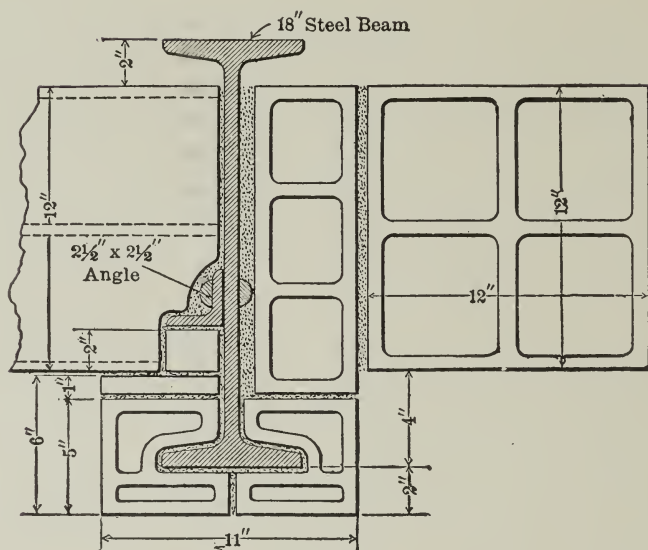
Details of Raised Arches, Skews and Flange Covering.
